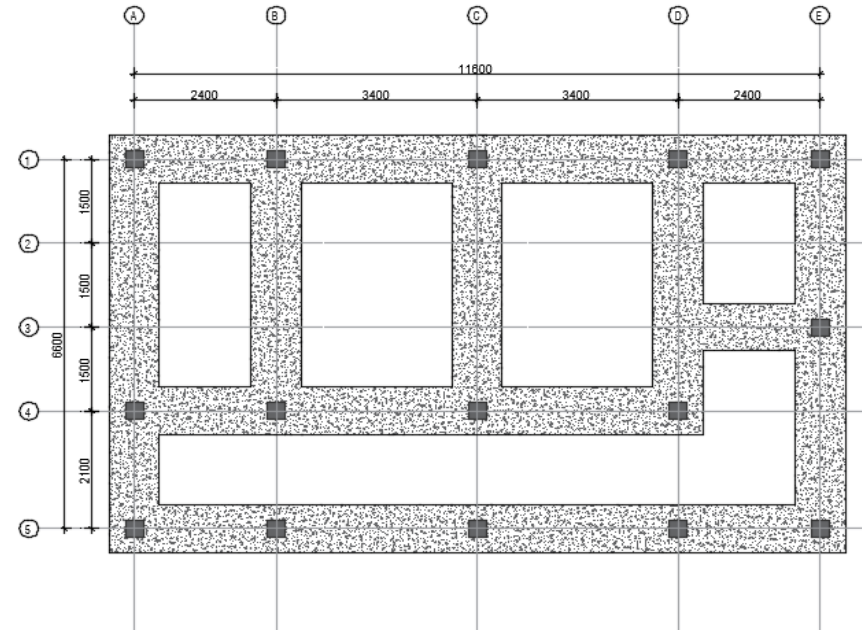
Foundation plan (Refer next page for 3D view)
